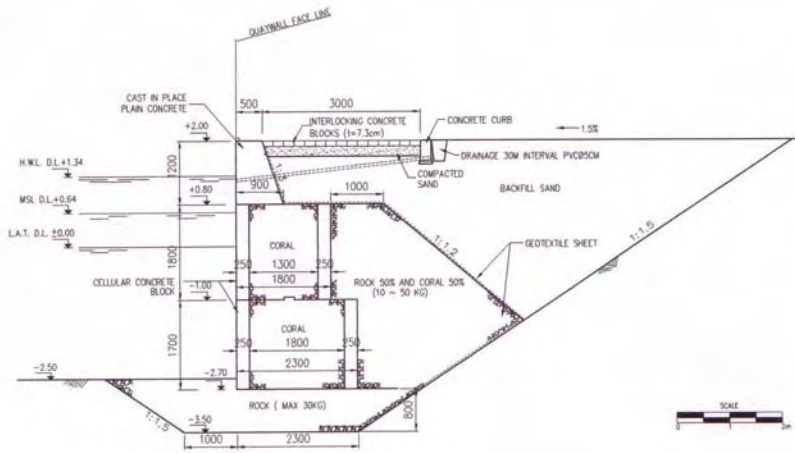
Cellular Concrete Block Type Quaywall
